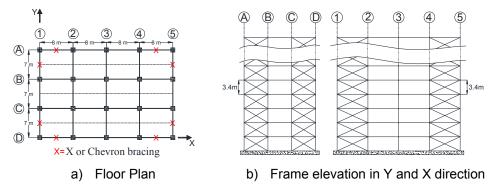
Typical floor plan and frame elevation for the building models under study
